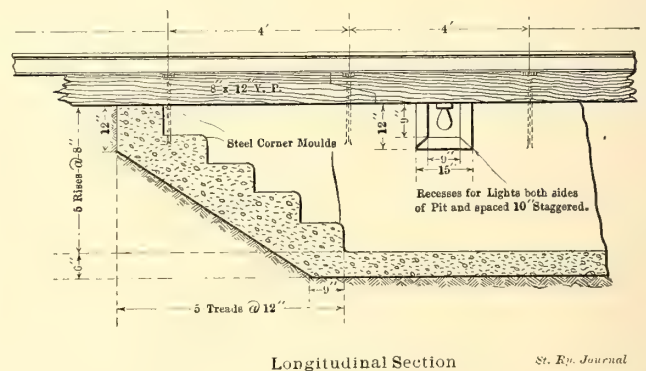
DETAIL OF STANDARD INSPECTION PIT FOR ELEVATED CARS, SHOWING THE LIGHTING
